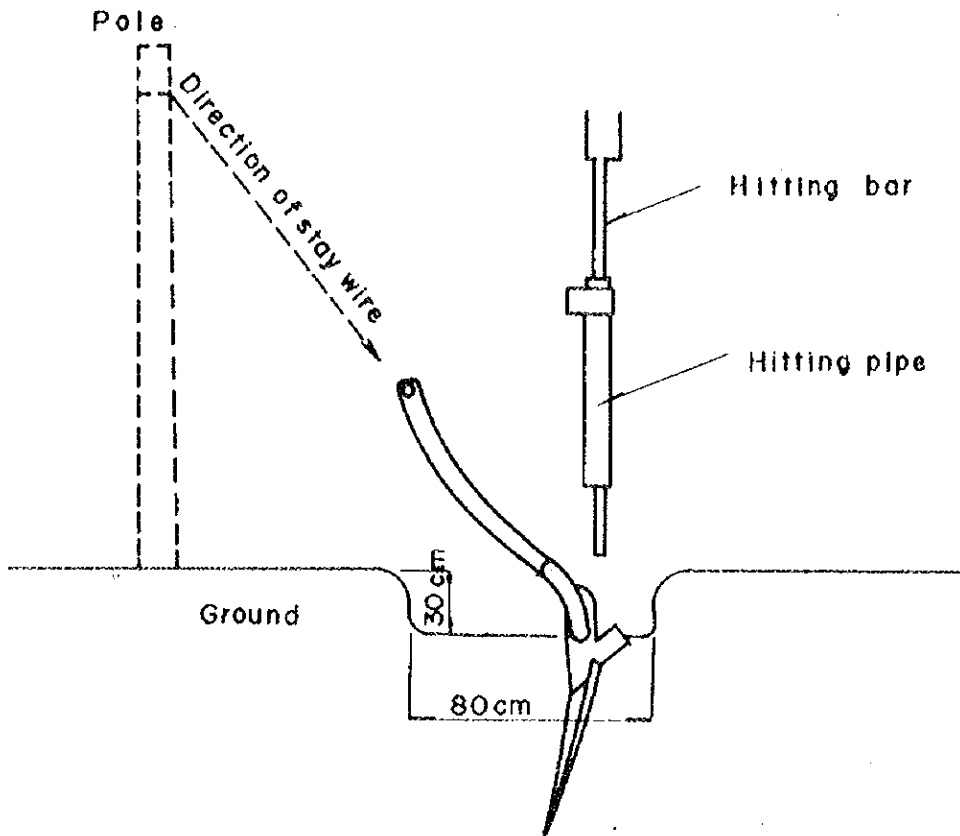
Installation of Stay Anchor (1/4)
